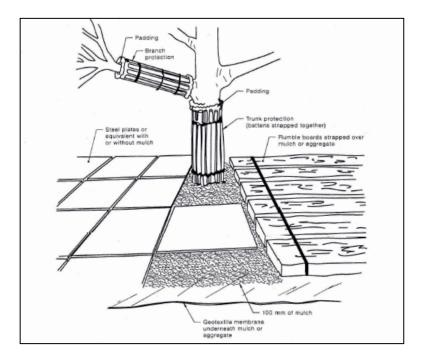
Example of trunk, branch & ground protection (AS4970, 2009)
